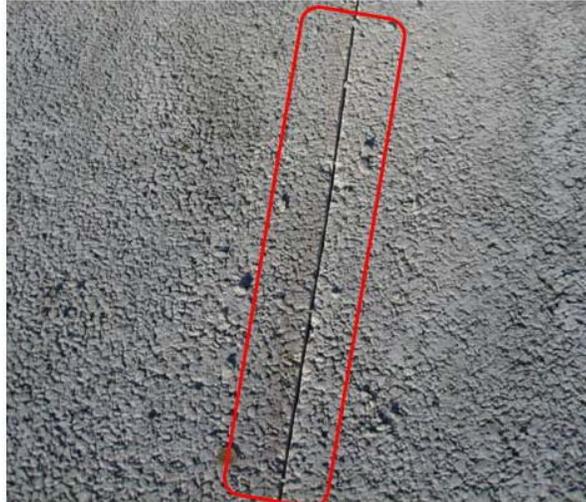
Saw Cut Joint After Construction Site 4 August 2009 (10 Months)
